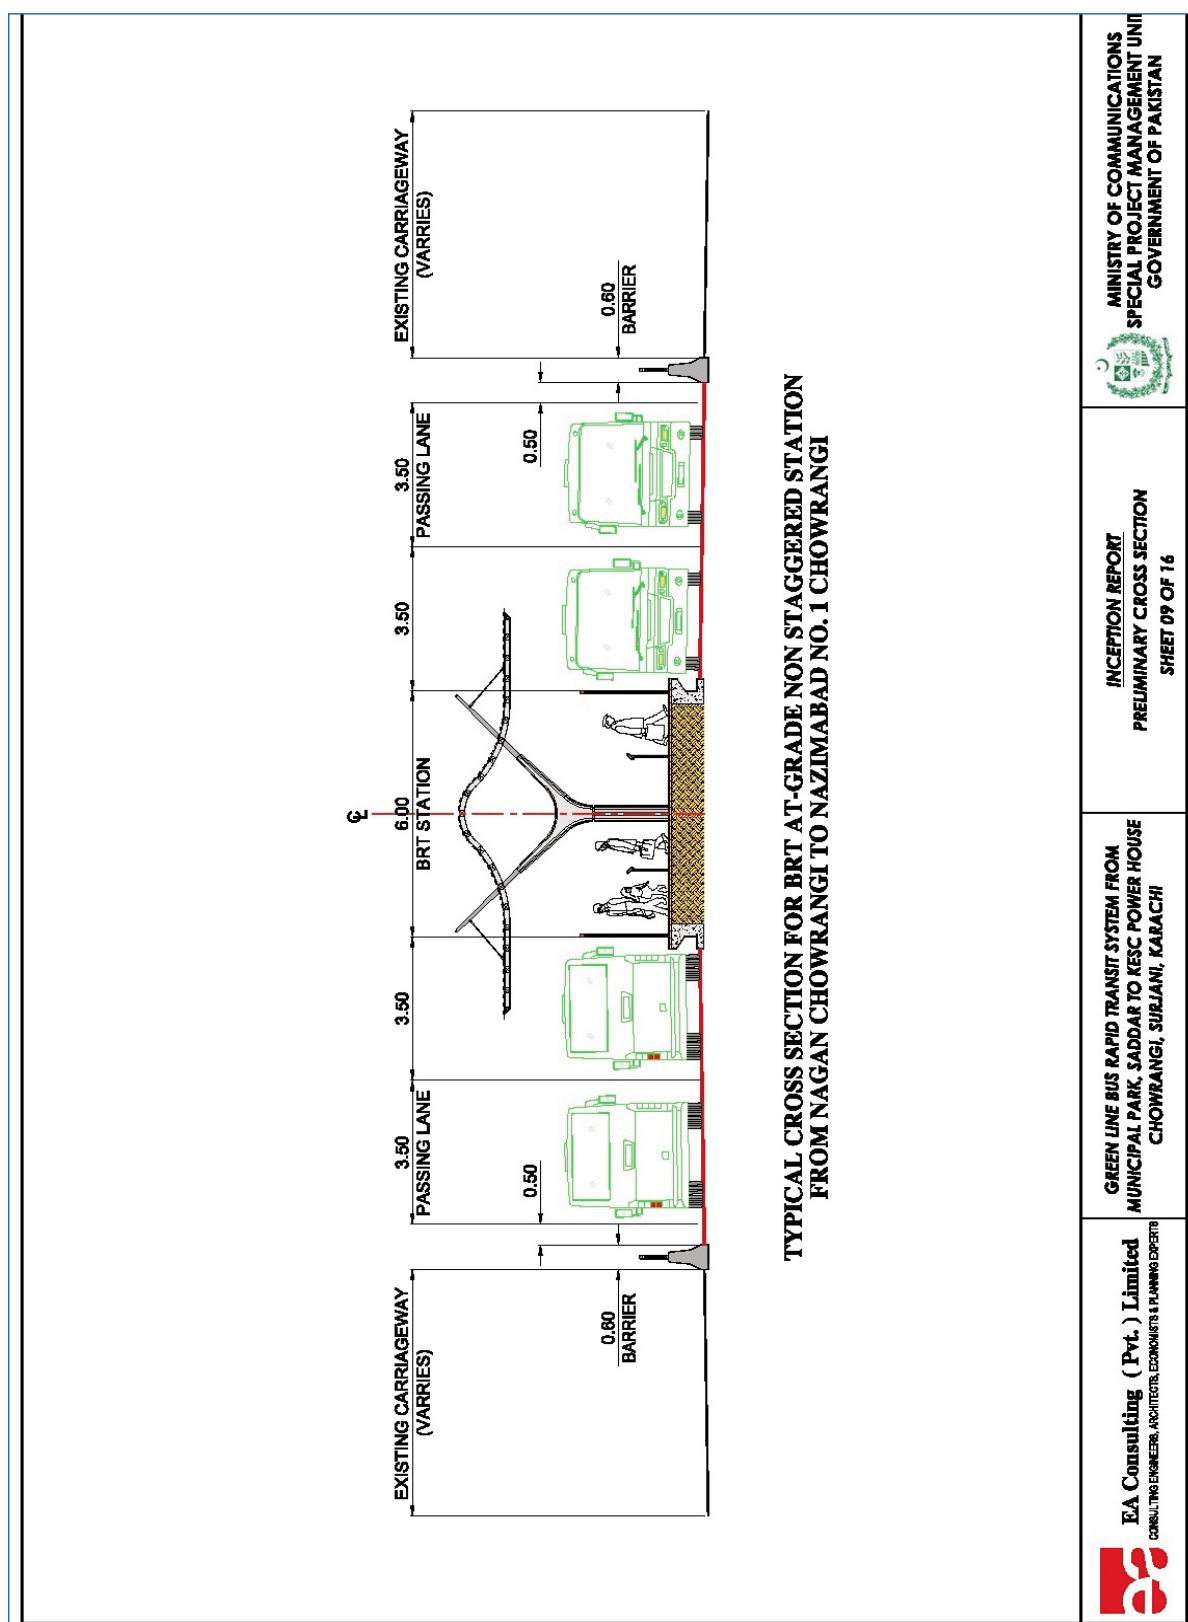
Segment 3: X-section of BRT Non-Staggered Station
